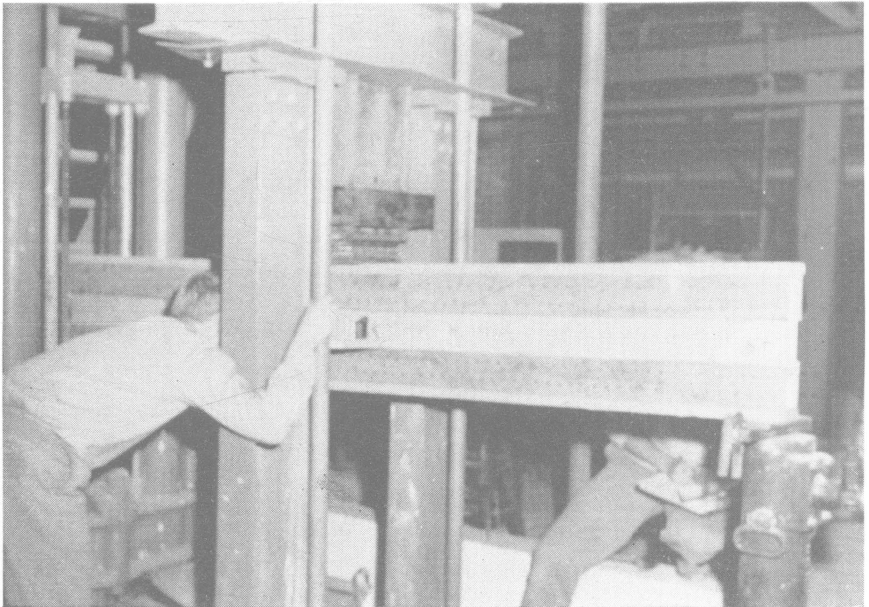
Testing of an 8-foot lattice beam on an hydraulic testing machine.
